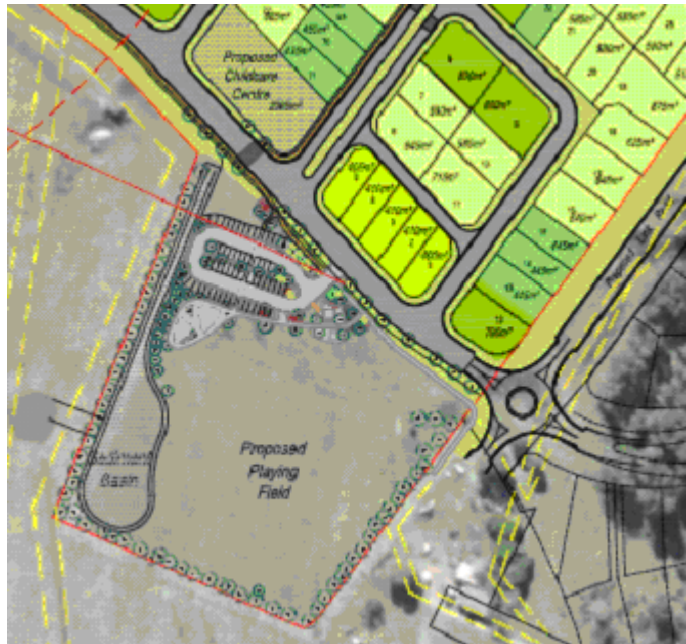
Proposed playing field adjacent to Link Road (Conics 2008).
